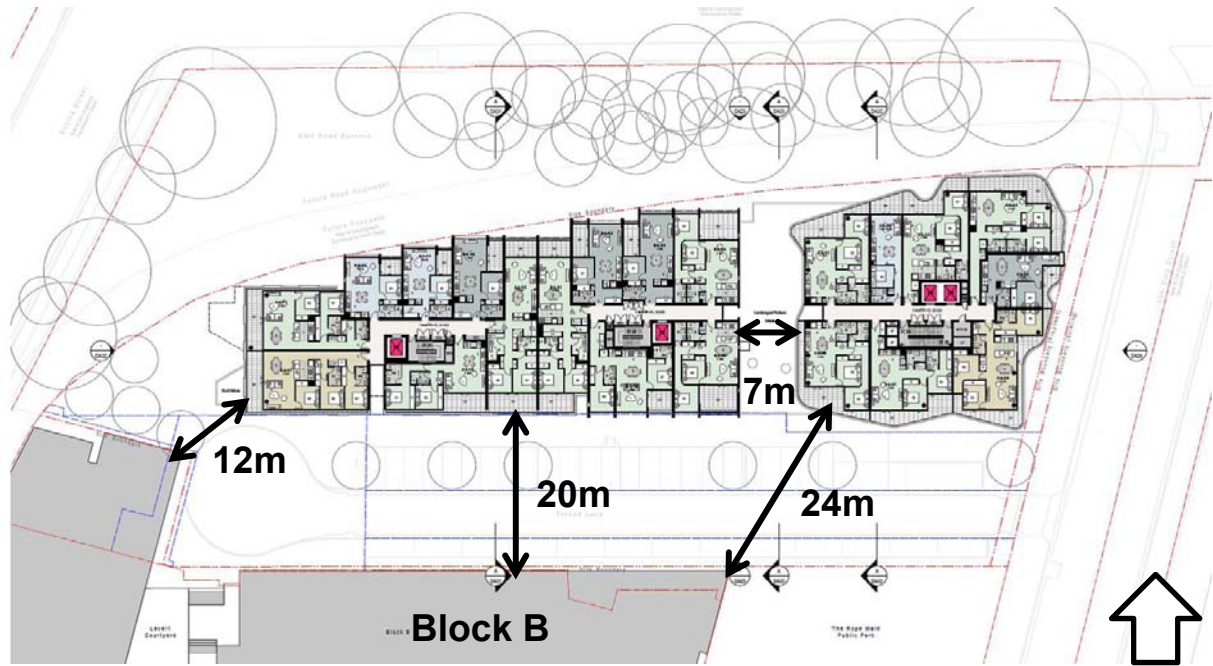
Diagram of Level 4 illustrating building separation to Block B.
